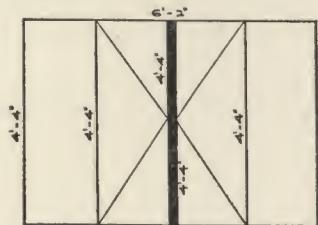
This figure shows another type of casement window. This window has fixed or stationary sash on each side. The center section, 4'4" high and 3'2" wide, is hinged for opening. To determine the linear feet of crack of this window we have six cracks 4'4" high and two cracks 6'2", long, or a total of 38'4" or 38' in even numbers. It will be noted that although the side sections of this window are fixed or stationary and do not open, the cracks are to be figured the same as for the portion that does open. This is advisable, because due to settling and shrinkage, the fixed portions often become loosened and allow infiltration.
